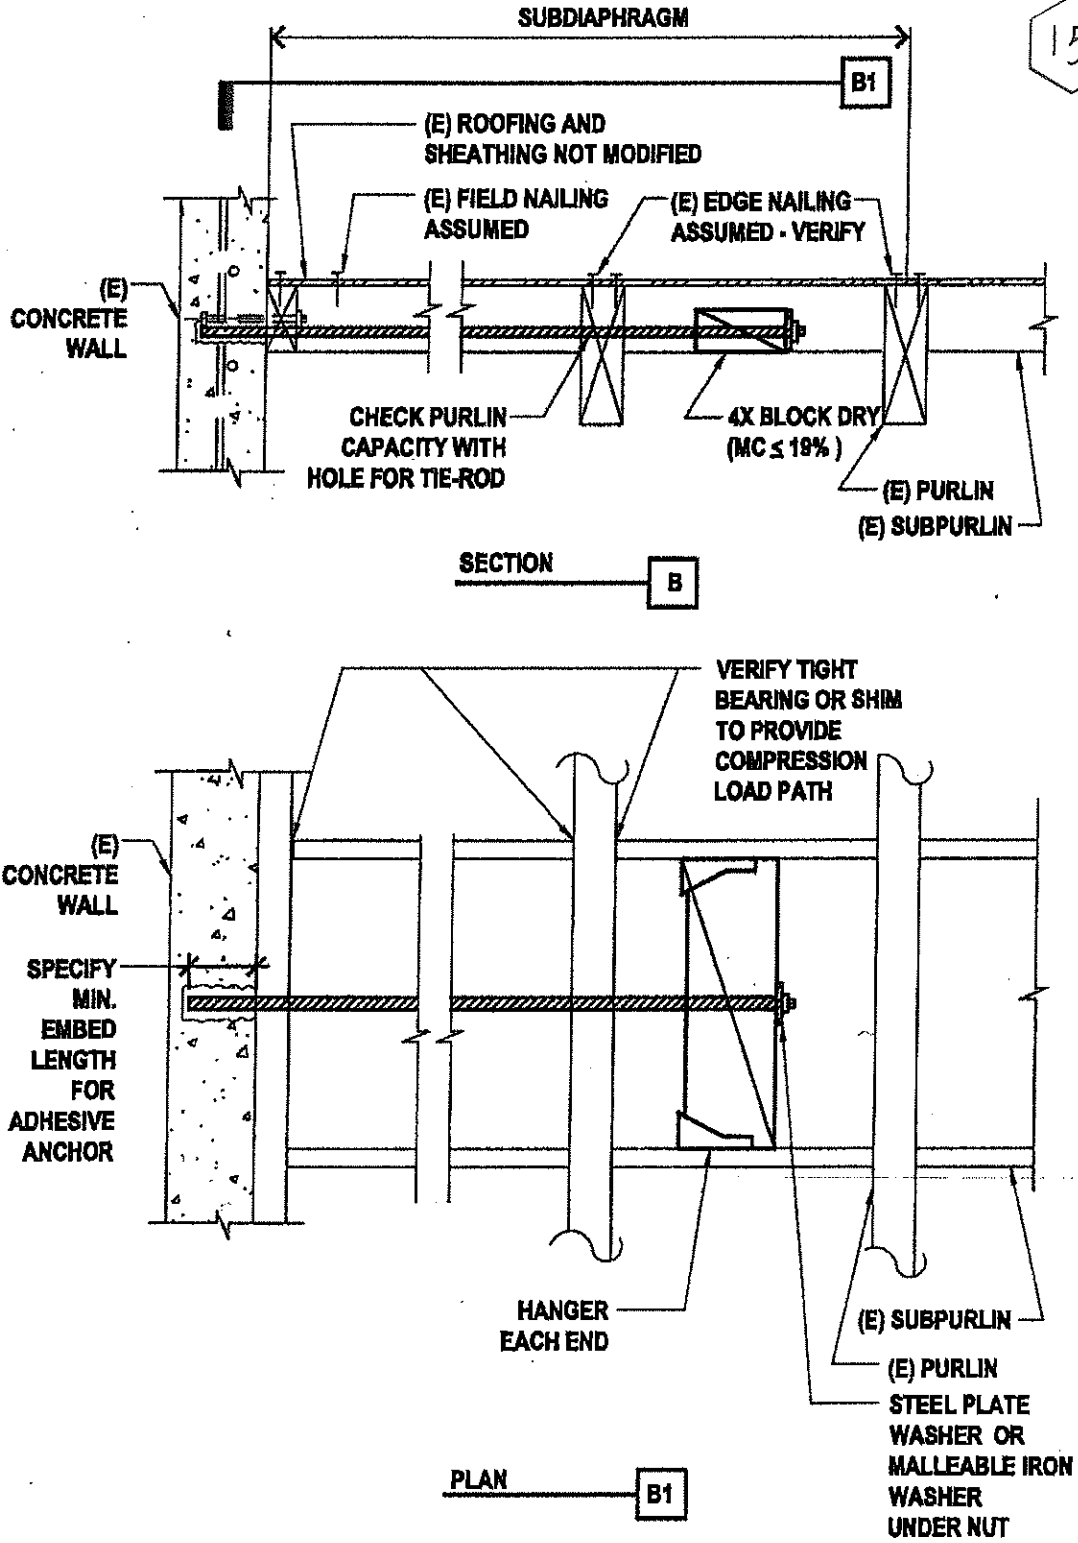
B: Wall Out-of-Plane Anchorage for Flexible Wood Diaphragm at Subpurlins – Roofing Not Removed
